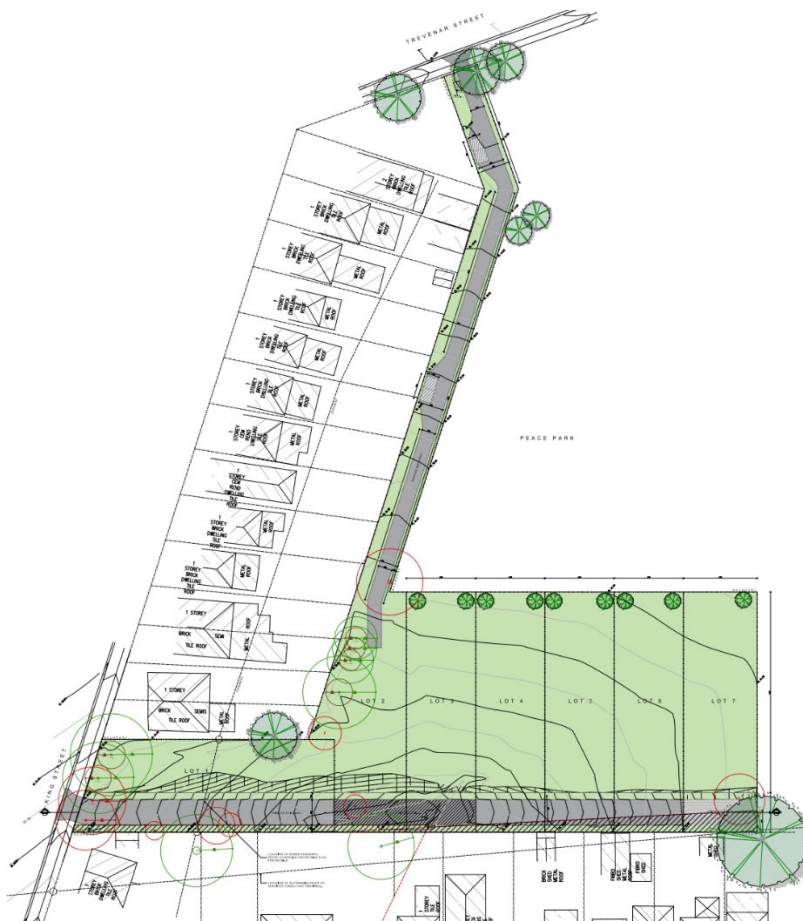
Proposed subdivision of the land (Source: DA 703/2021, September 2021)
